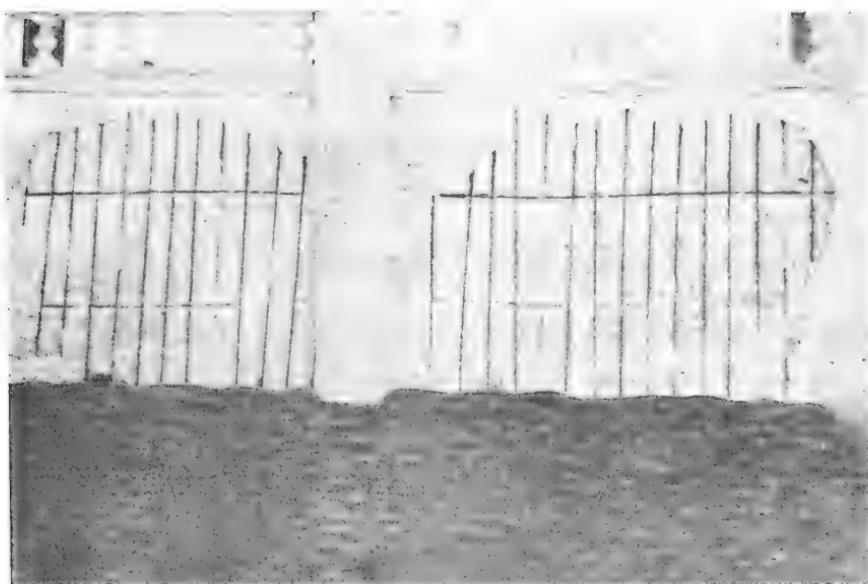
Spalled face of concrete wall due to inadequate rebar imbedment.
